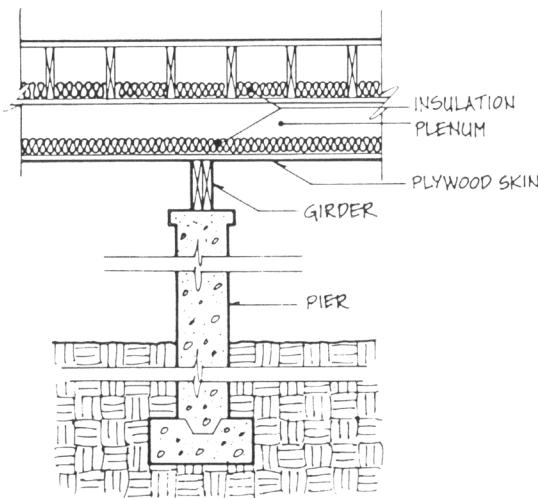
Double-Insulated Floor Plenum, Pier Foundation
